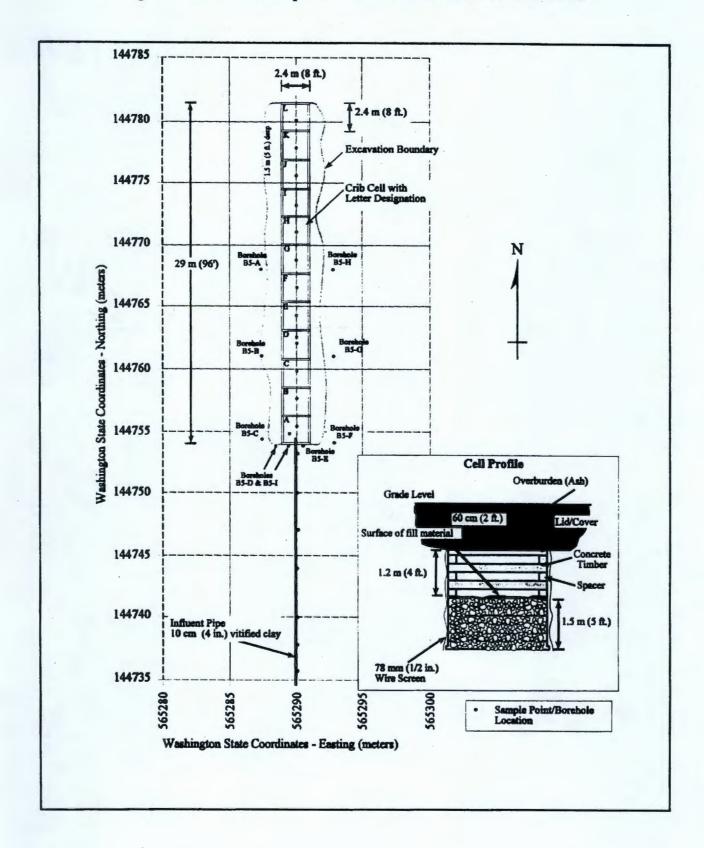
116-B-5 Sample Locations at Elevations 137 to 138.9 m.
